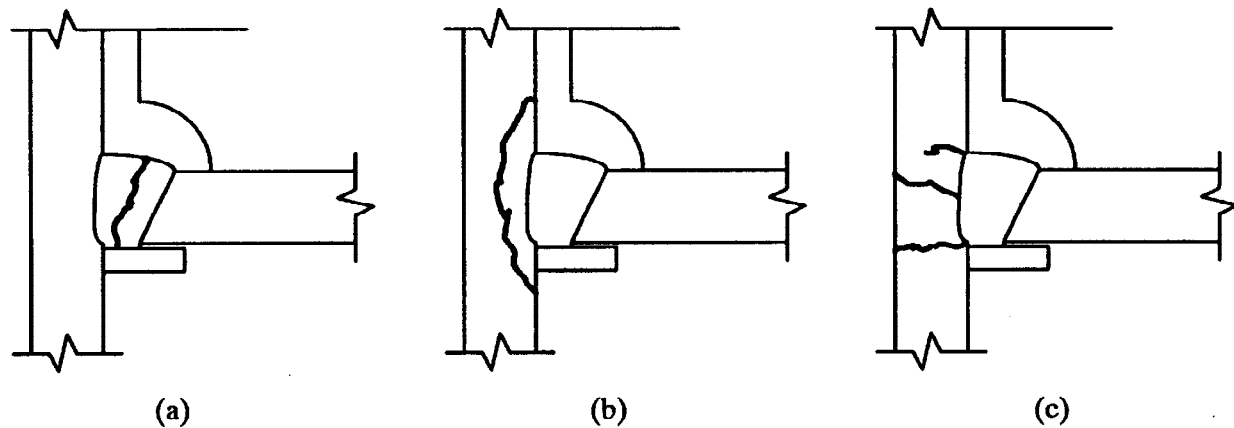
Typical failures for SMR connections: (a) full or partial crack through weld metal or HAZ; (b) flange tear-out or divot; and (c) partial or full column flange or web crack (after (Youssef et al., 1995)).
